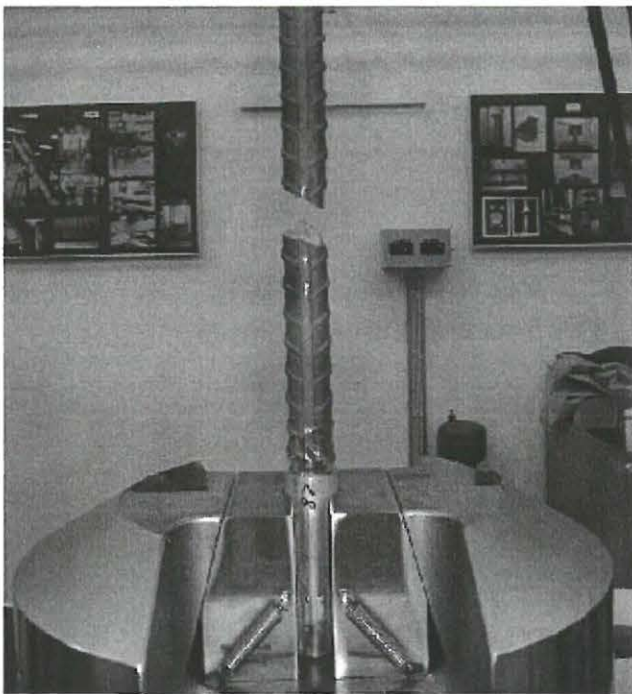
Photo of a rebar with an aluminium tube between the rebar and the grips of the testing machine.
